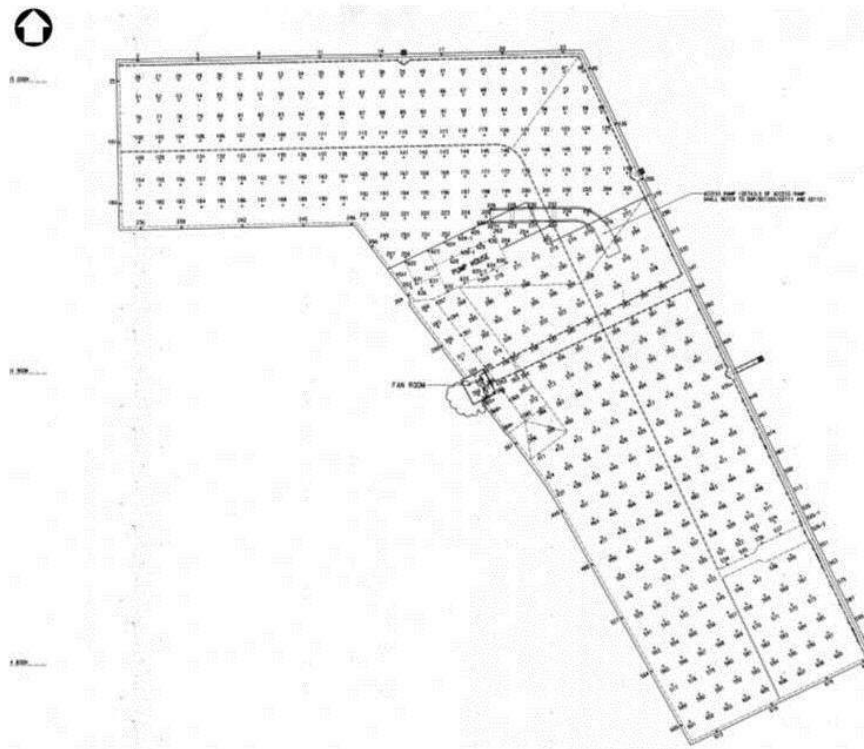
Conforming piling layout plan of the underground stormwater storage tank
